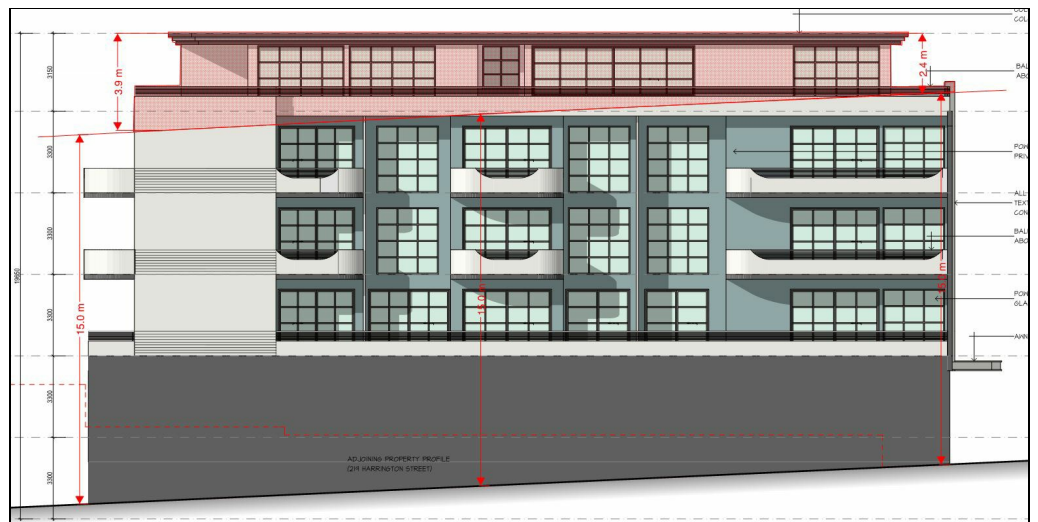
The proposed building's north-western (side) elevation. The profile of the adjacent building at 219 Harrington Street can be seen dotted in within the lower dark grey area. The elements of the proposed building above the compliant 15m height limit can be seen hatched in red at the top of the building.
